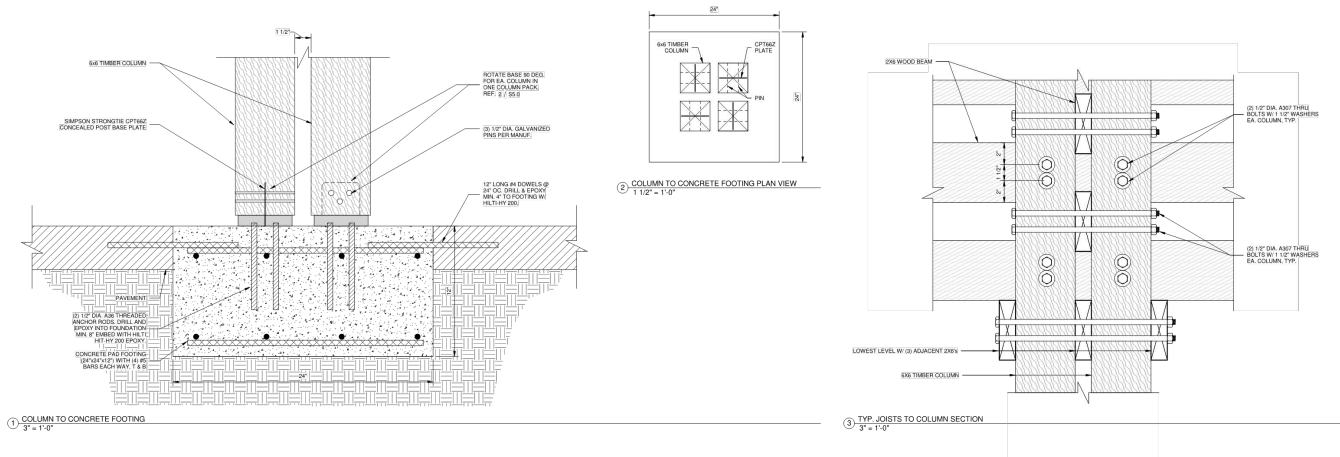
The Modular Farmers Market Structural Framing Connection and Details
